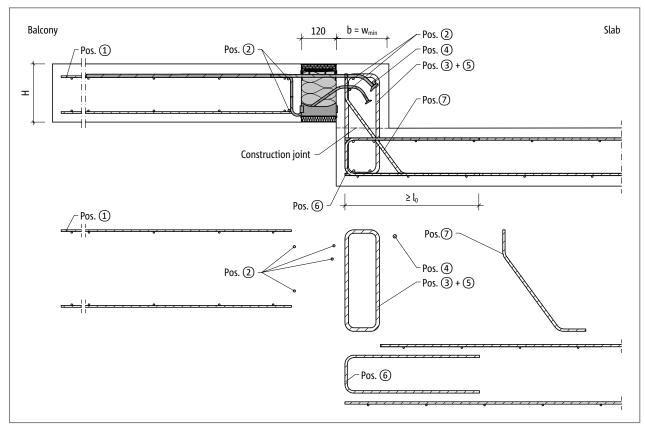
Schöck Isokorb[®] XT type K-O: On-site reinforcement for balcony with height offset upwards with minimum structural element dimension ($w_{vorh} = w_{min}$)
